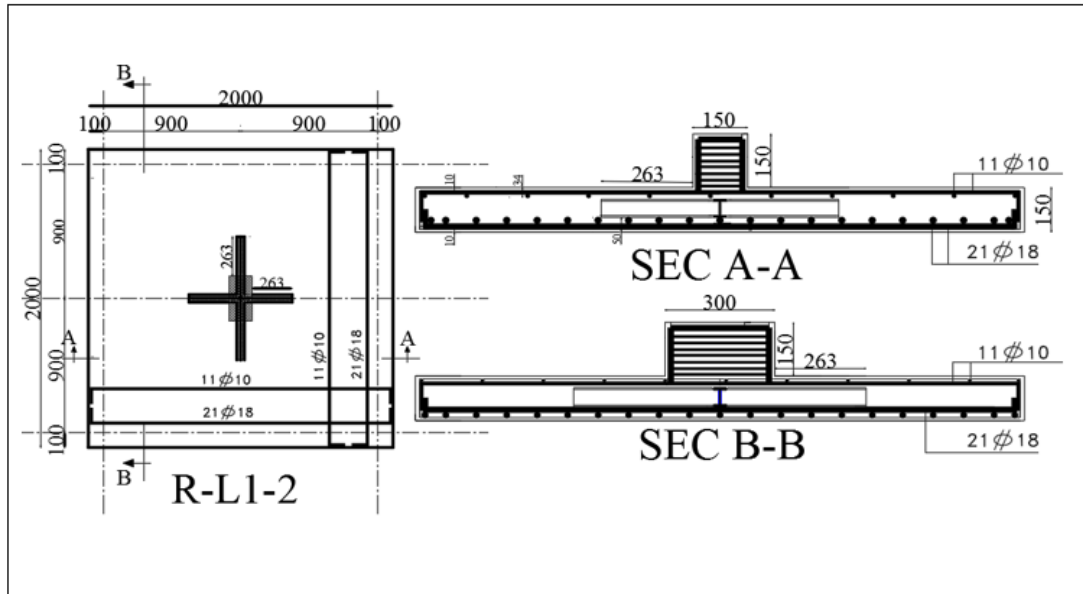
Reinforcement details of flat slab specimen "R-L1-2".
